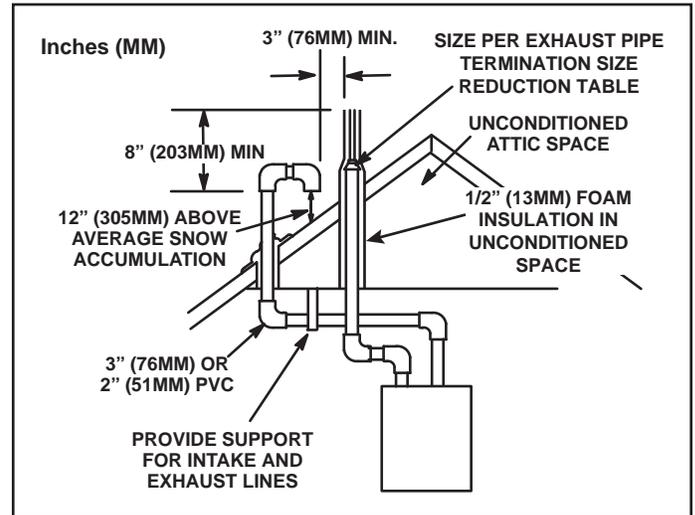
Exiting Exhaust and Intake Vent (no common pressure zone)
